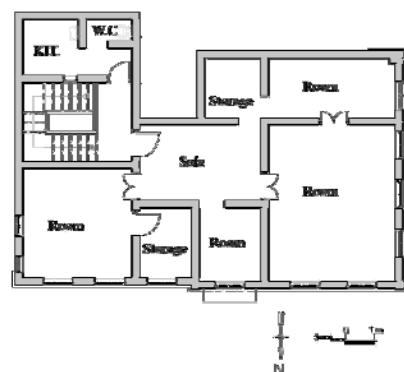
Bayt al-Sitt 'Awaṭif: First floor plan
